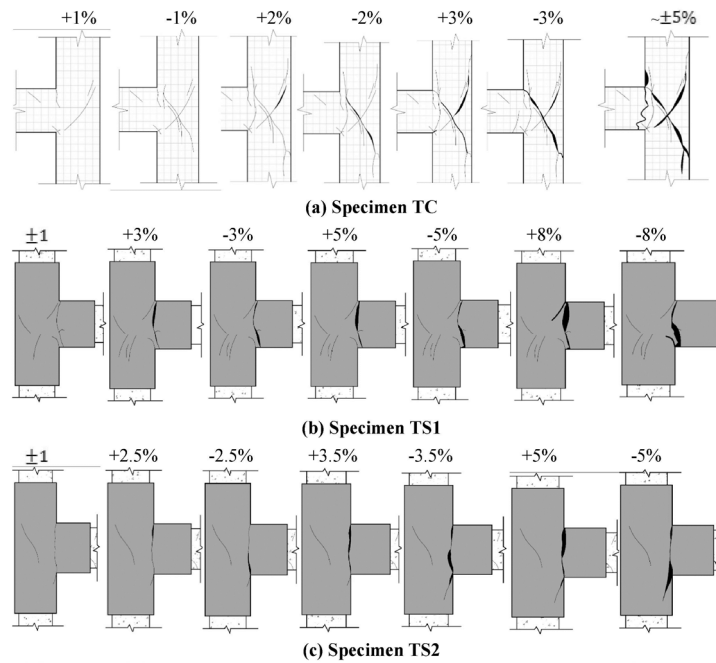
Damage evolution in beam column joints specimens: TC: un-retrofitted specimen, TS: retrofitted specimens [Khan *et al.*, 2018].
